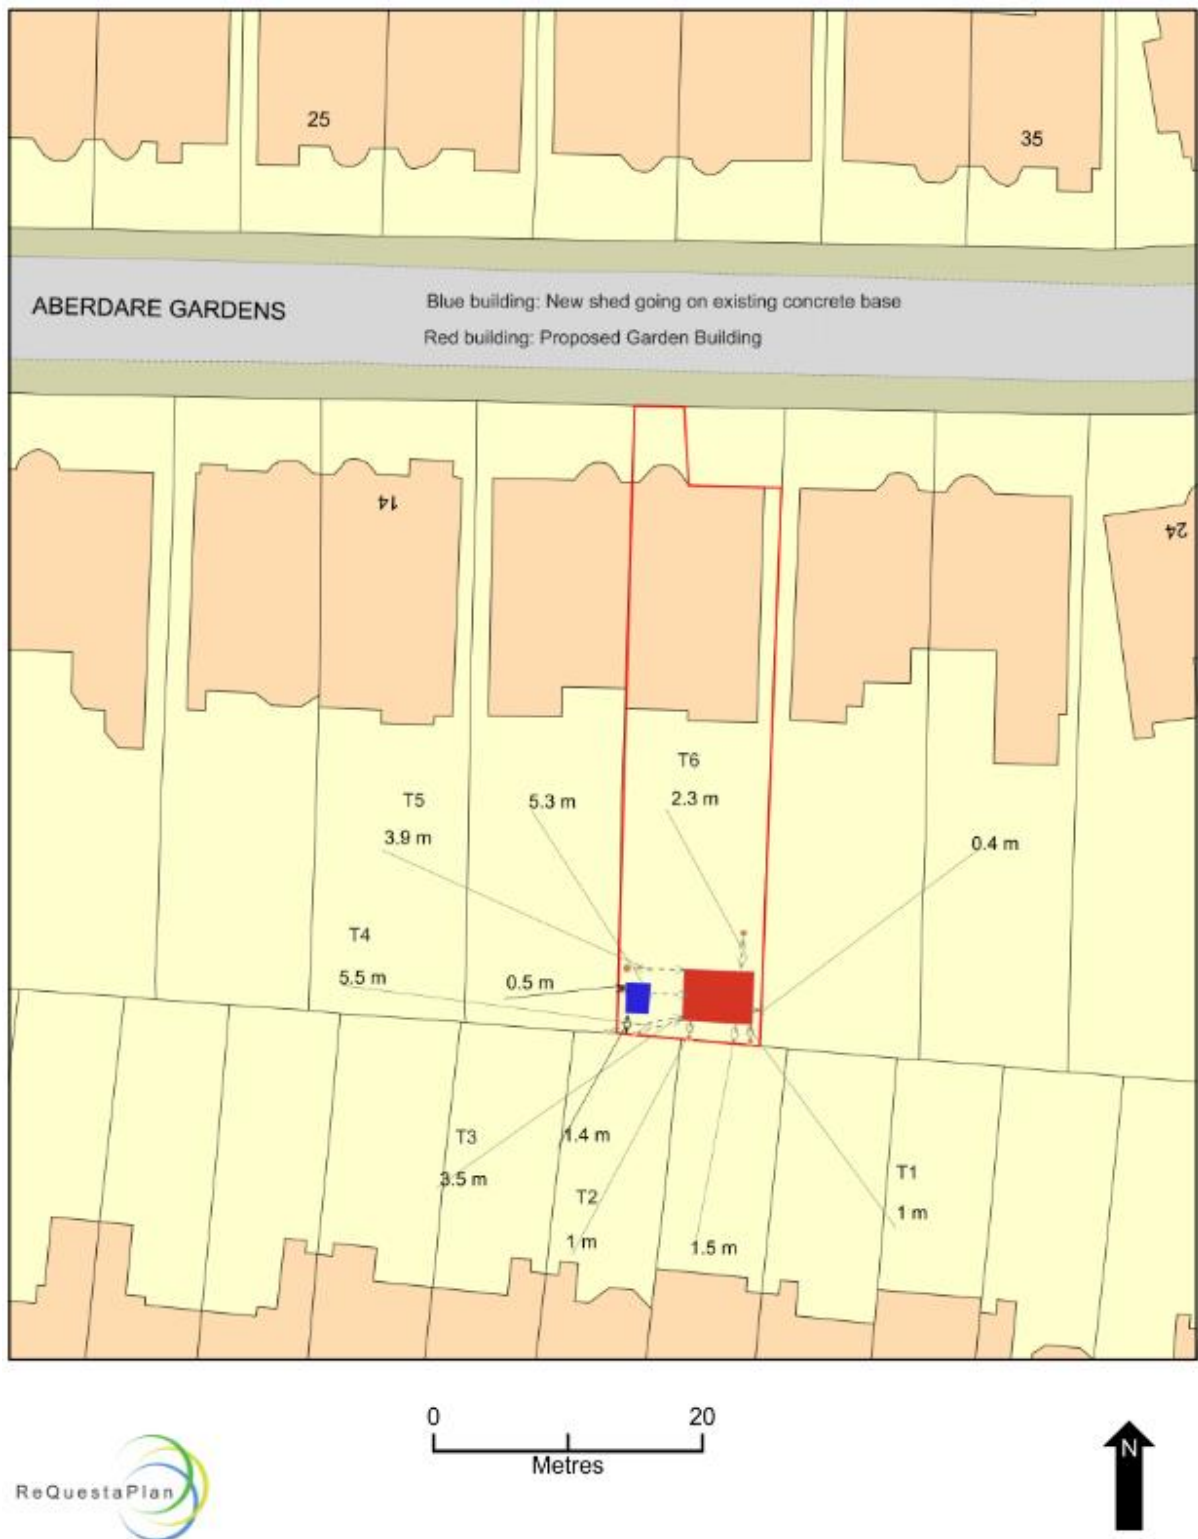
Block plan showing location of proposed outbuilding (red) and shed (blue)
